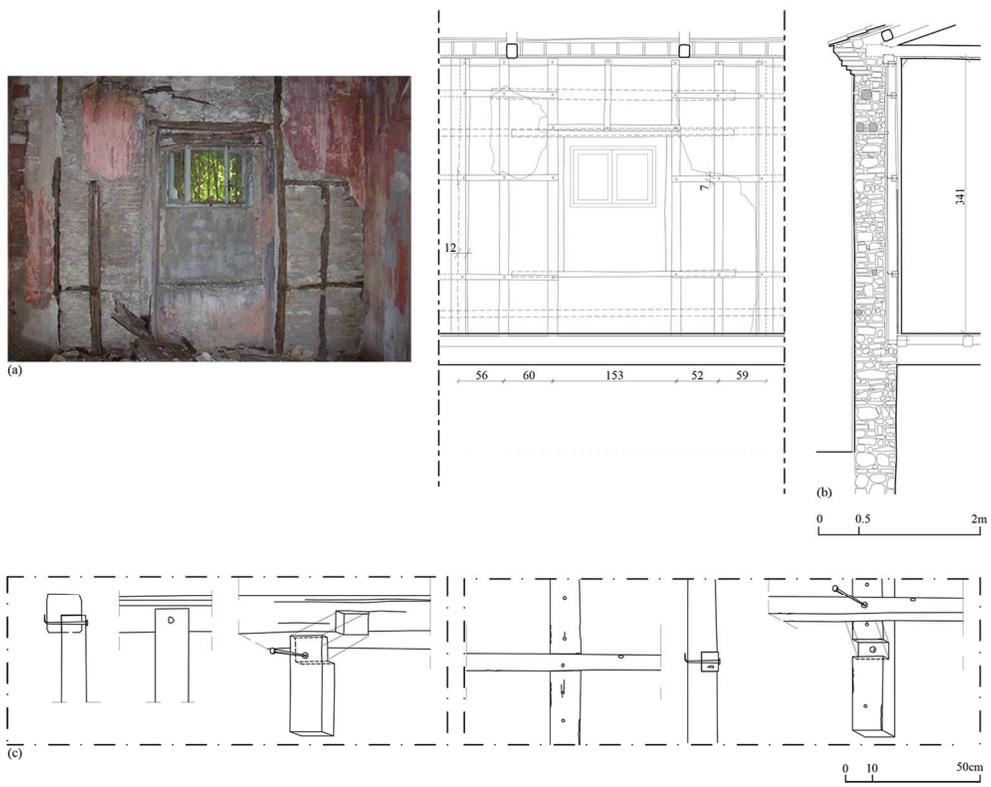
Borbone case study: (a) photo and survey of the partial elevation (interior face); (b) section; (c) detail of timber connection
